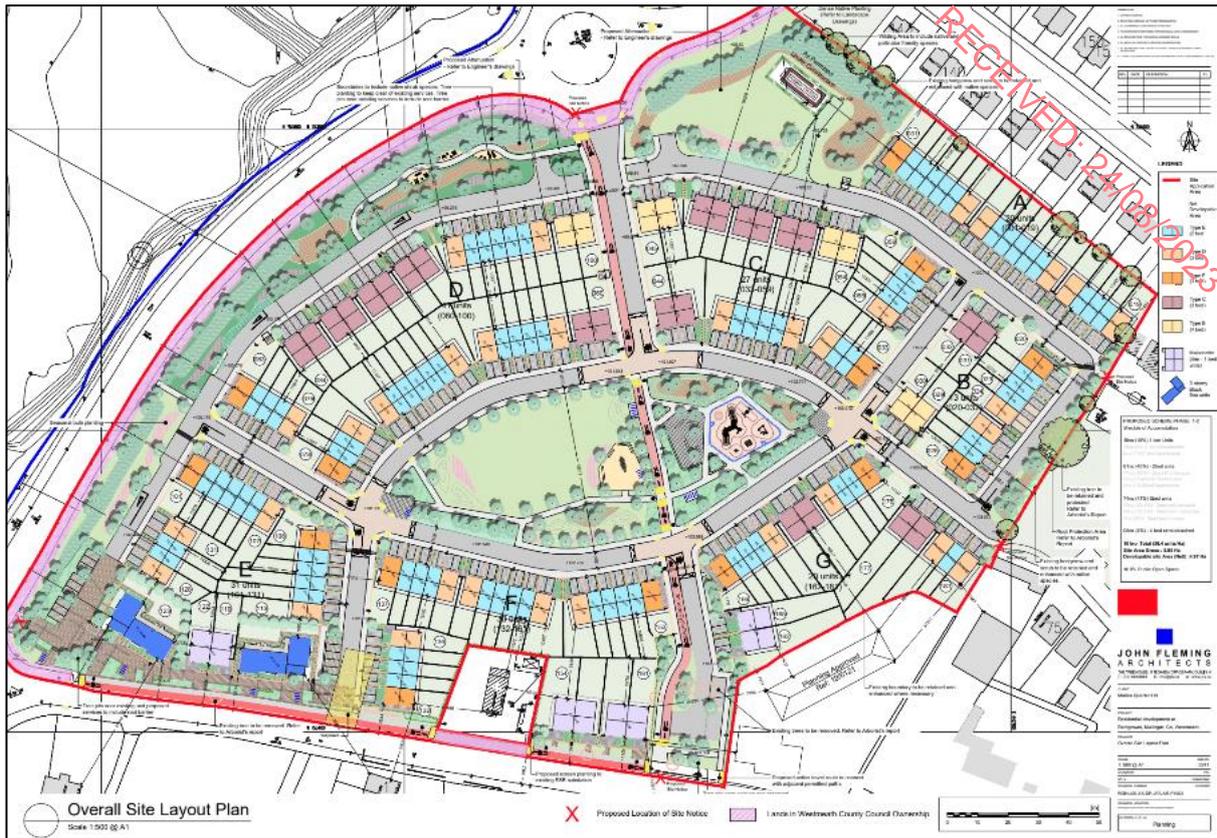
Alternative C: Layout submitted with LRD Section 32B Meeting Request
